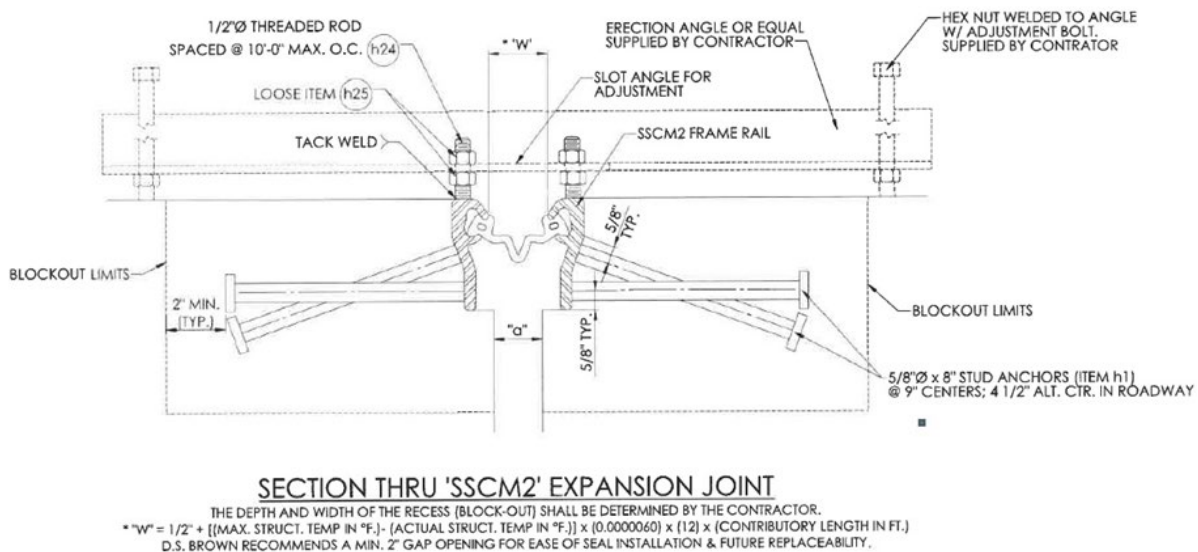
Diagram from DS Brown Joint Seal Assembly Shop Drawings
